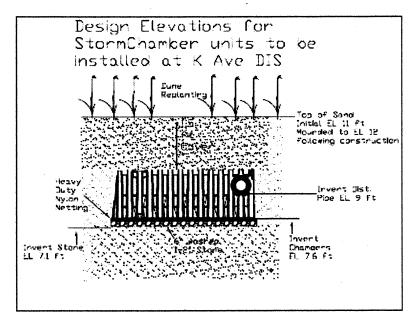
Cross section of dune system with the proposed elevations for installing the Site K DIS.
